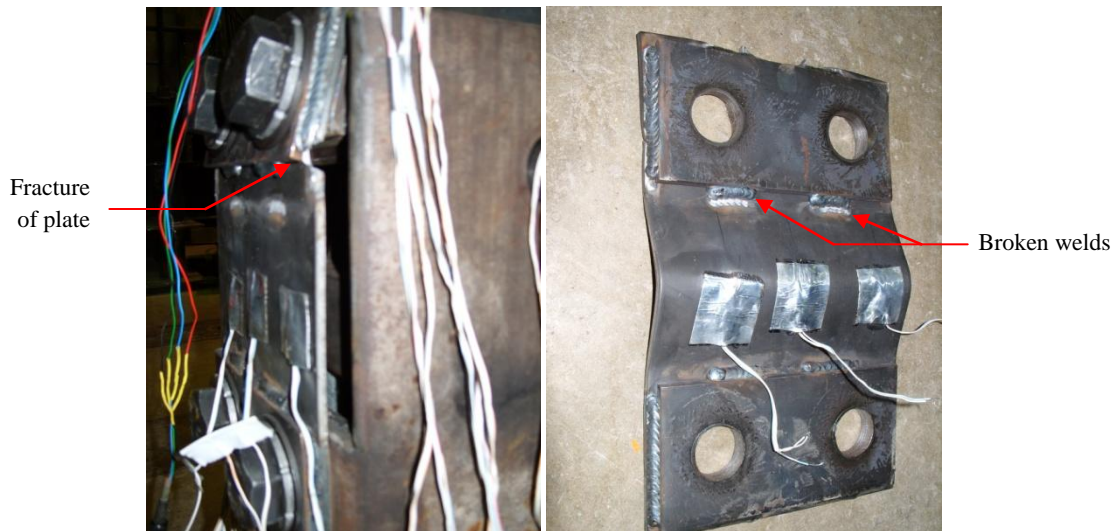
Redesigned structural fuse plate highlighting fracture of the plate and welds
